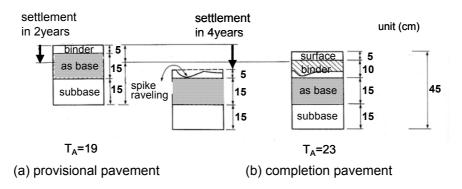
Structures of asphalt pavement in the section of Hokkaido Expressway
